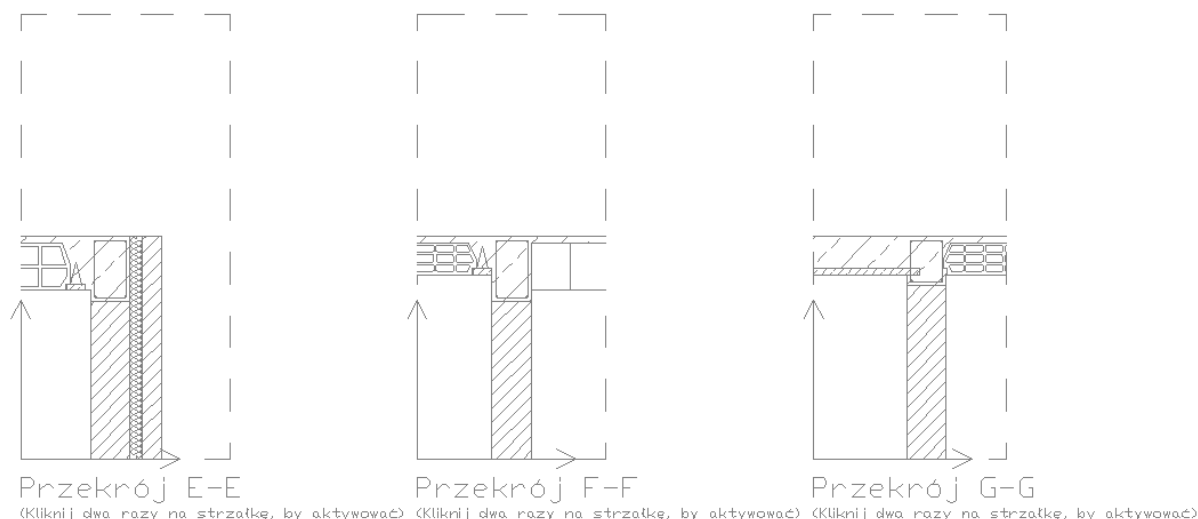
Examples of wall coping solutions for internal and external walls
